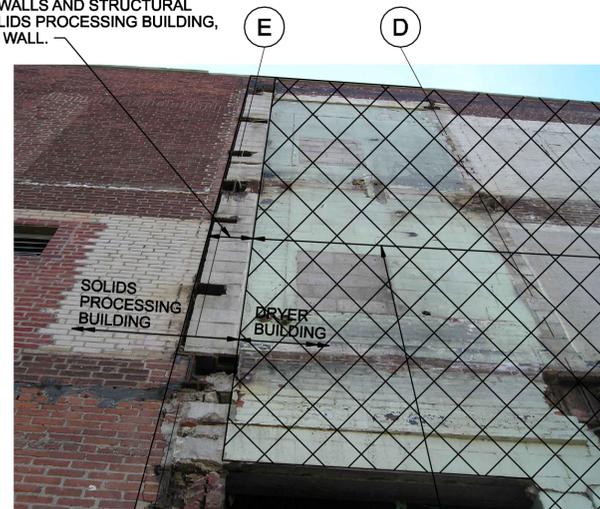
WALL ALONG COLUMN LINE A (LOOKING EAST)
